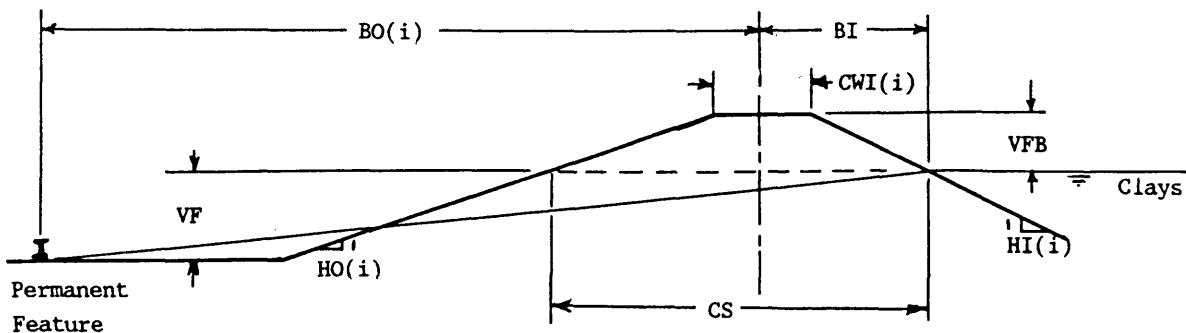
Case 1 Cross Section: Allowable Grade Met?
